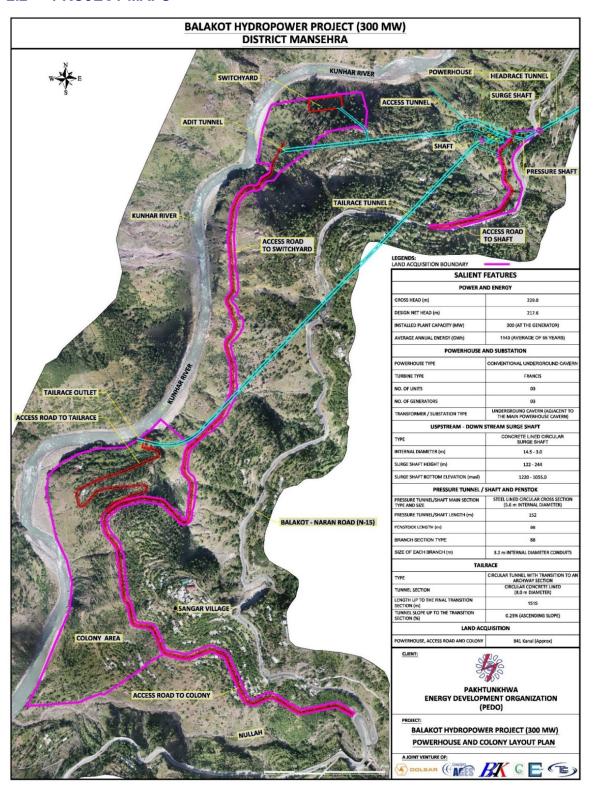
Staff Colony, Access Road and Powerhouse Area
